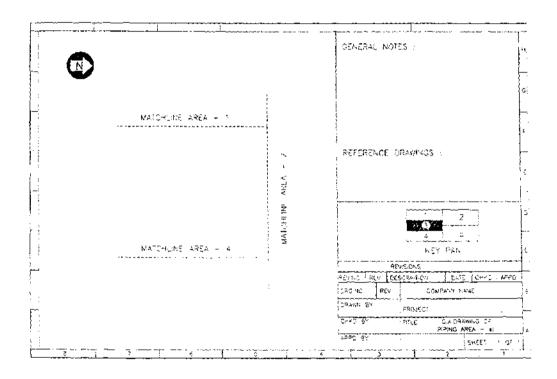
TYPICAL GENERAL ARRANGEMENT OF PIPING
